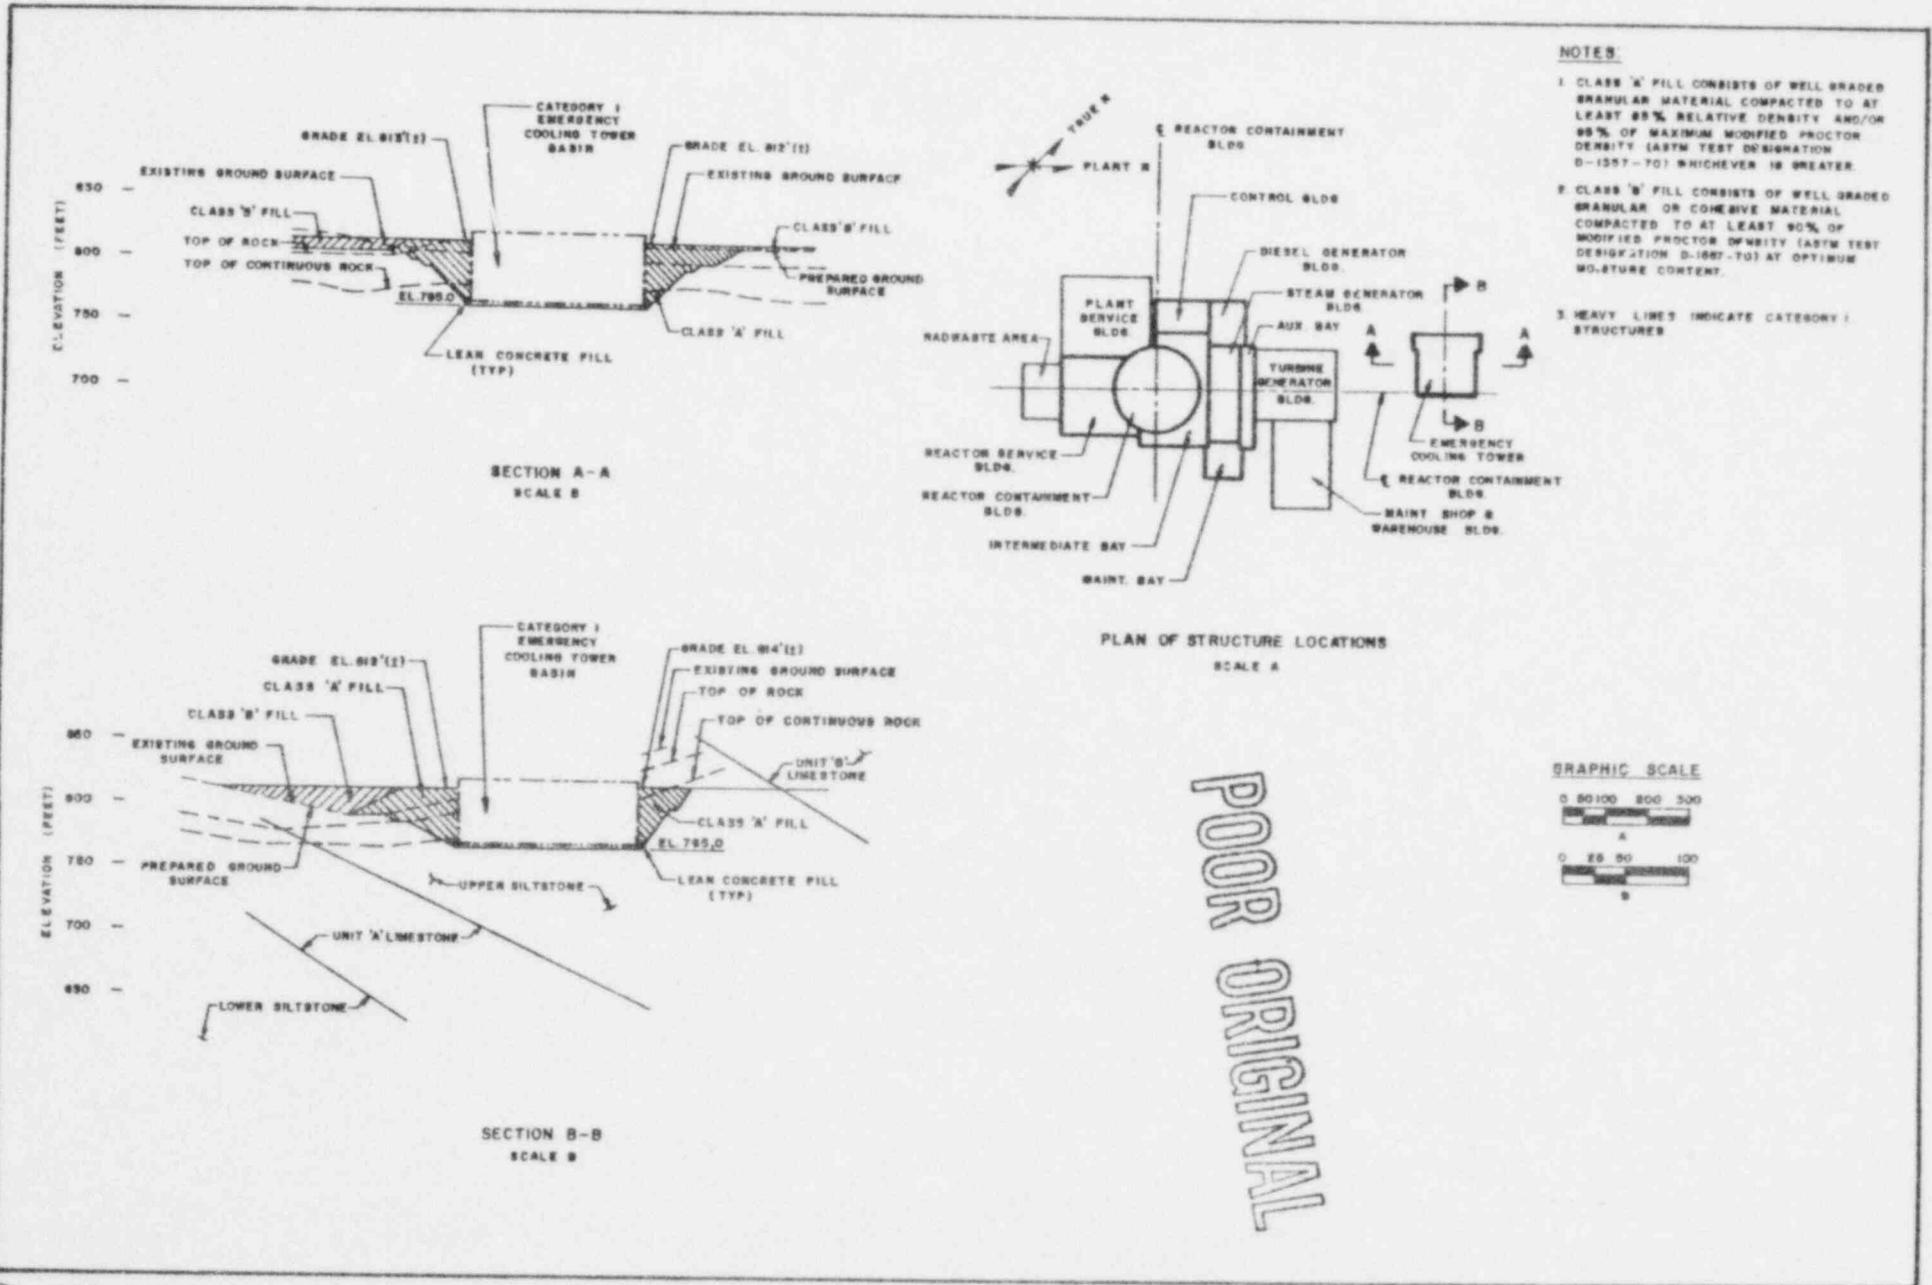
Excavation and Backfill Schemes - Category I Cooling Tower
